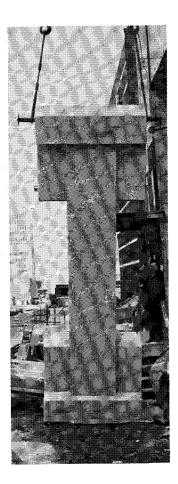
Precast segments being lifted into position on sixth floor where they will comprise first truss.
